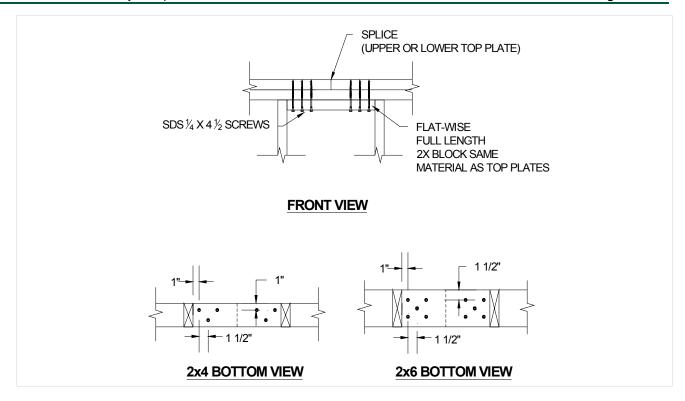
TOP PLATE SPLICE: BENDING REINFORCEMENT (SPLICE BETWEEN STUDS)
